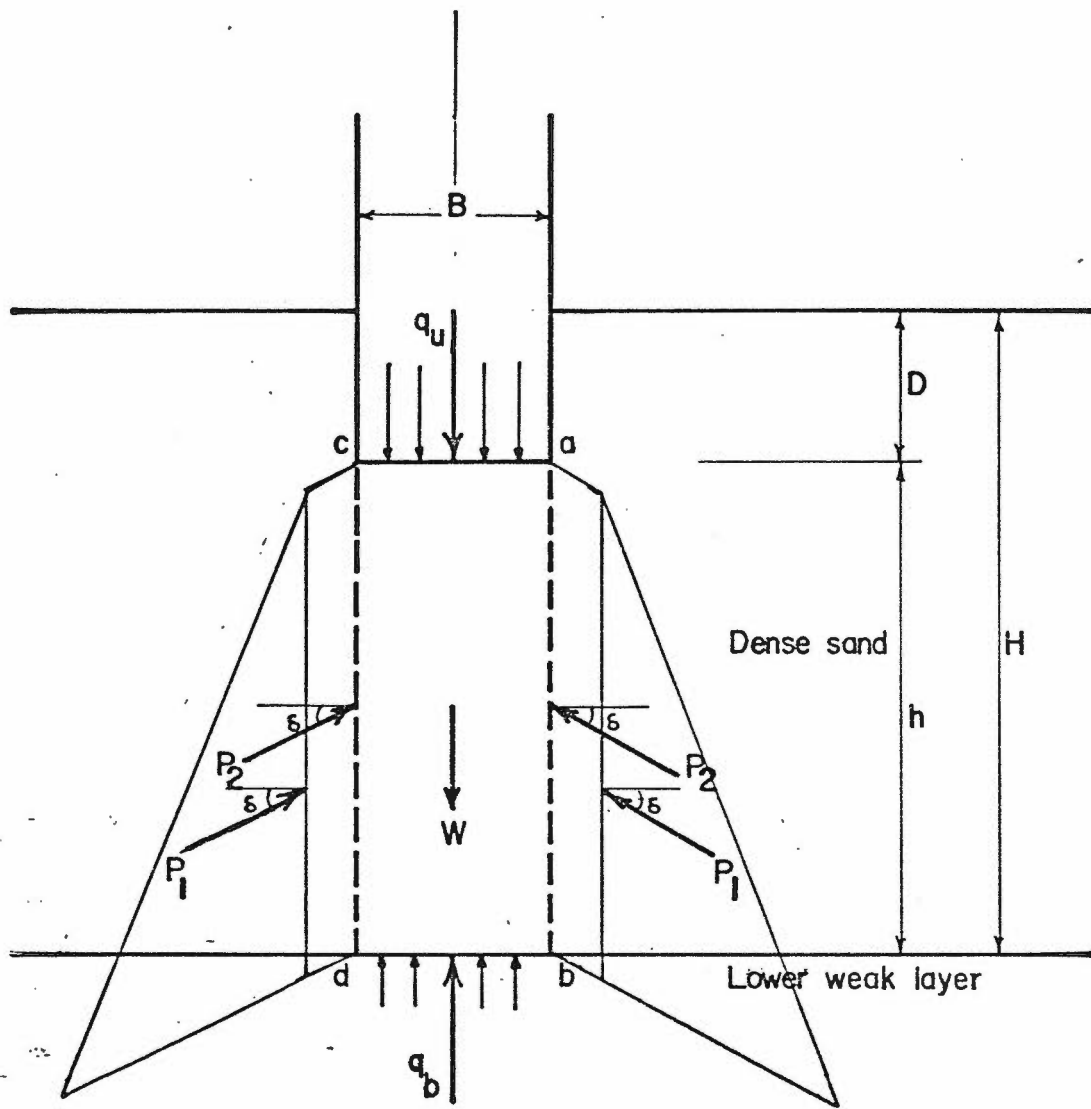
STRESS DIAGRAM — STRIP FOOTING UNDER VERTICAL LOAD
